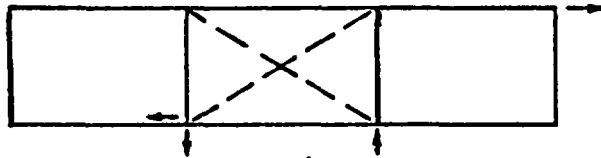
X-BRACED FRAME (diagonals in tension; verticals in tension or compression).
